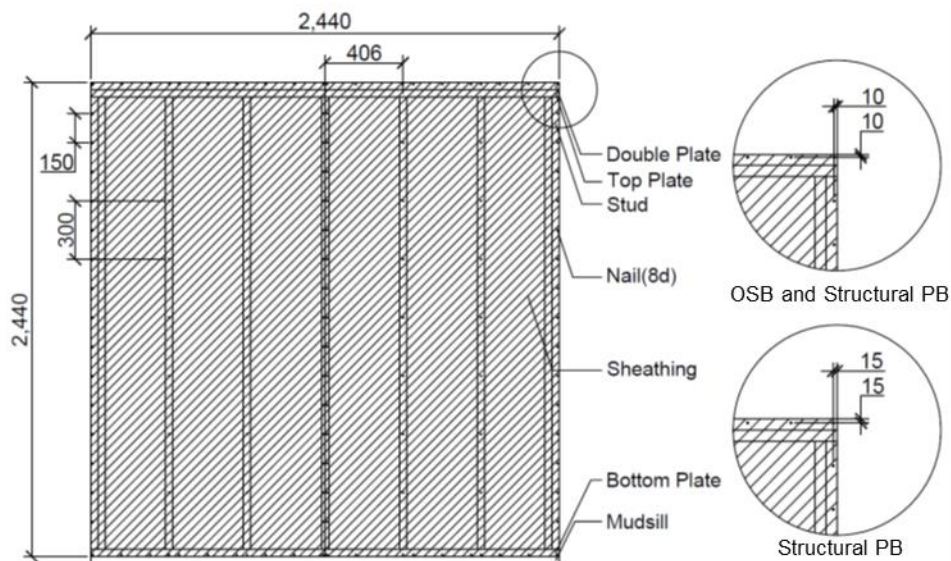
Schematic picture of nailing for light-frame wall with OSB or structural PB (Right: nailing distance from the edge of each panel) (Unit: mm)
